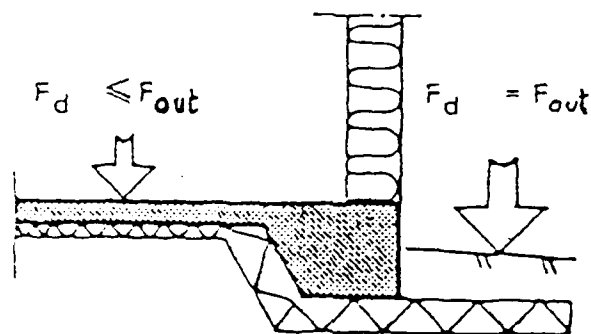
The foundation wall and outer foundation are exposed to the outer climate, regardless of the frost load indoors on the floor.
